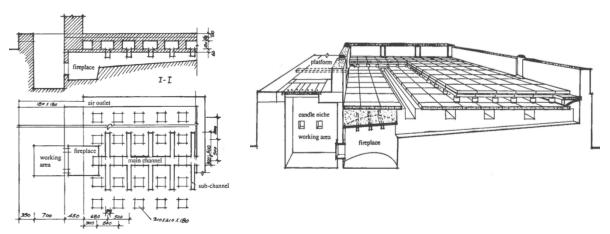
The structure of dikang: plan and section of the Jingyi Xuan Building (left) and axonometric drawing after Zhang Yuhuan Zhongghuo Gidai Jianzshu Kishu (right) (Guo 2005)
